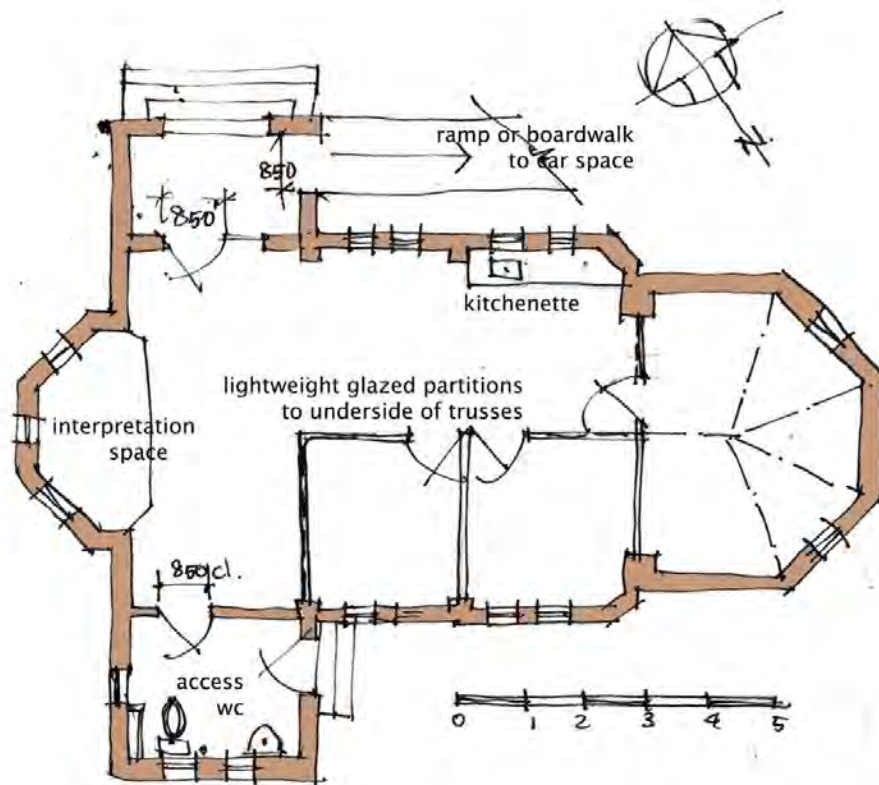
SKETCH OF POSSIBLE ALTERATIONS TO CHURCH BUILDING
